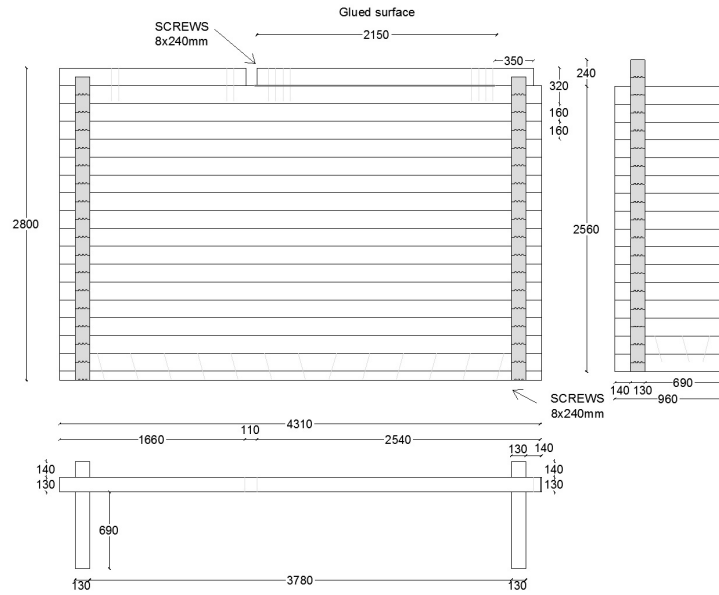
Dimension of M/C_ST_130 wall specimen.
